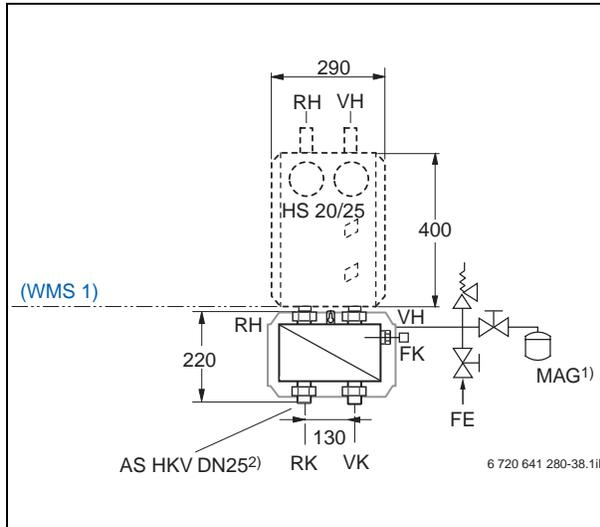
Dimensions of heat exchanger recognition with integral heating circuit pump (dim. in mm)
